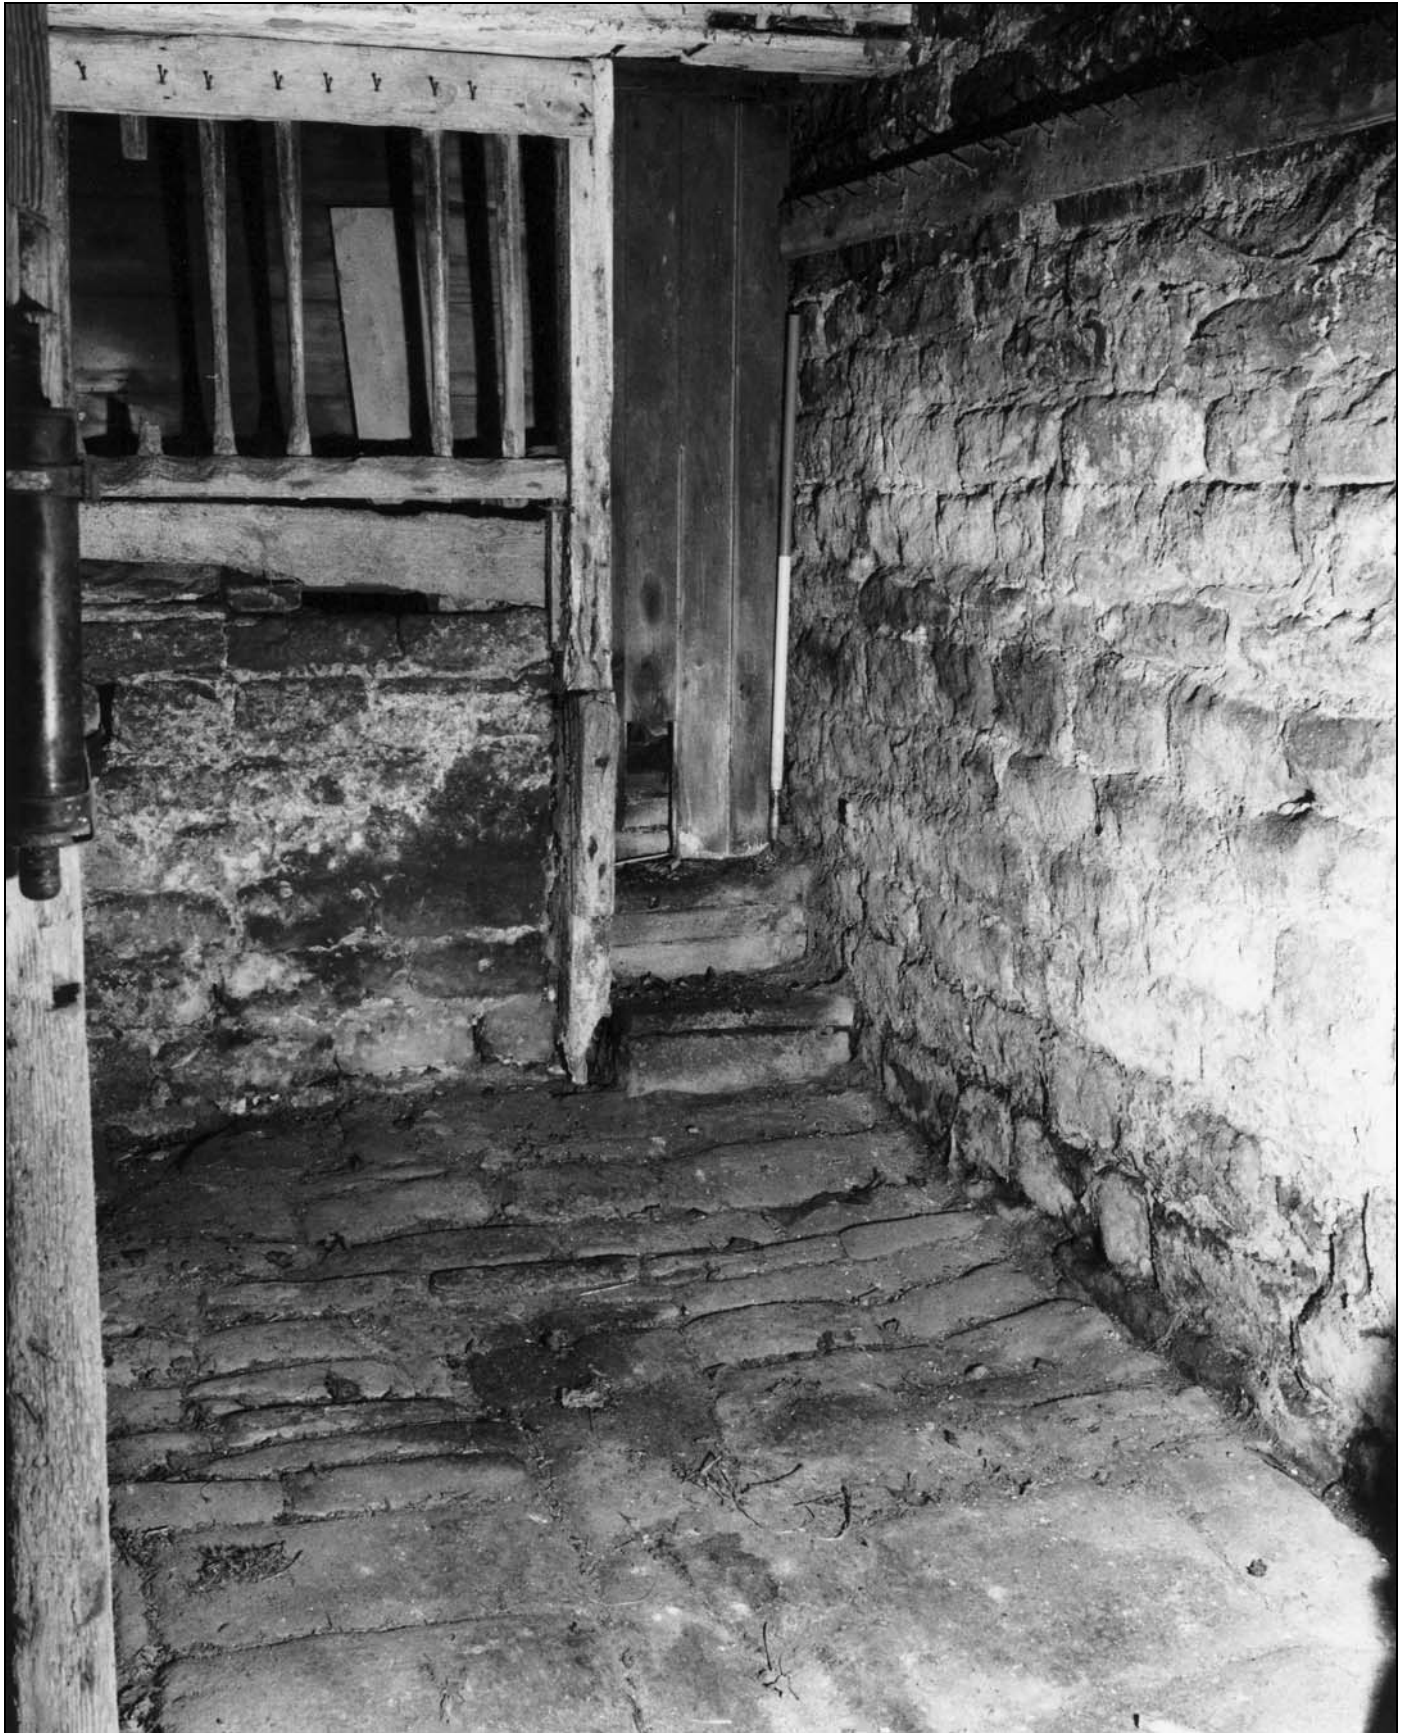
Stable within south-west corner of barn, from the west (film 2, frame 16)
